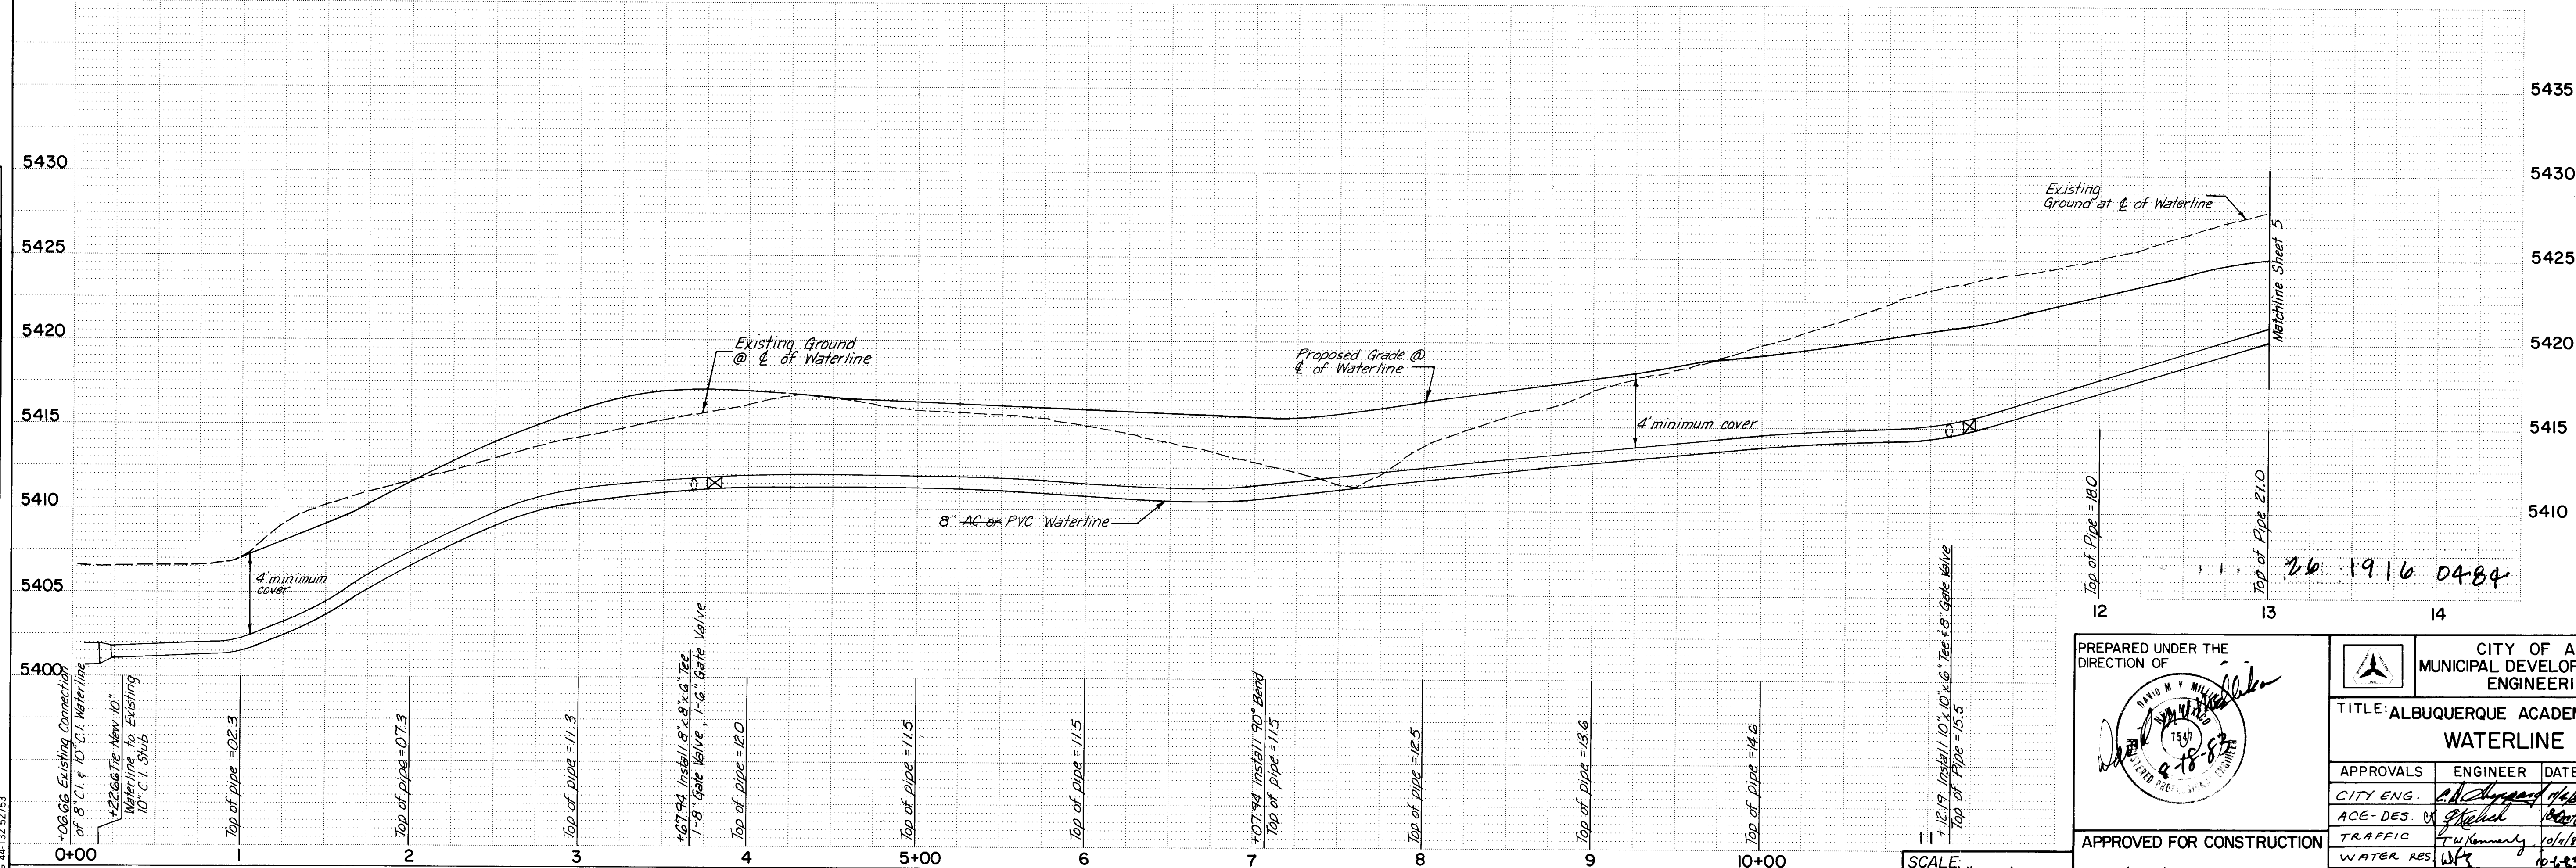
SINGLE PLAN - PROFILE - DOTTED
